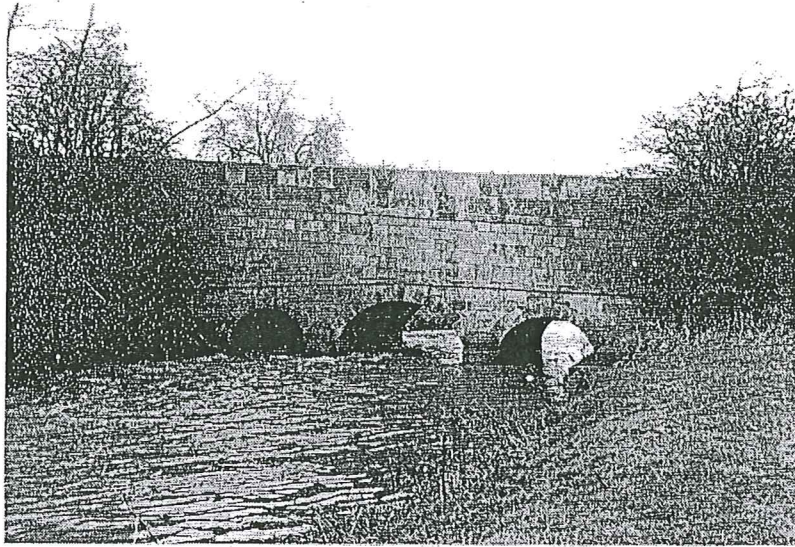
STANTON GATE BRIDGE AND WIXFORD BRIDGE
